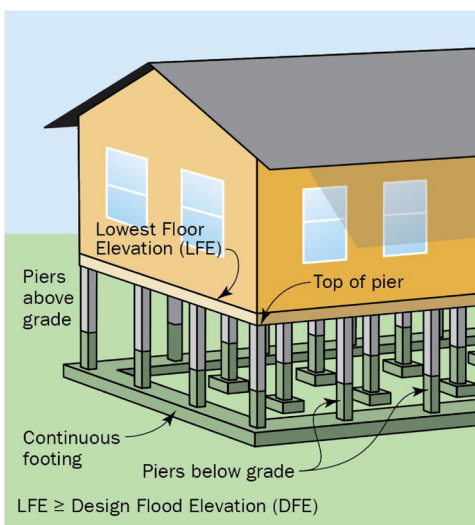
Open- Space Foundation (Pier & Beam) Construction Illustration (FEMA Advisory, 2023)
